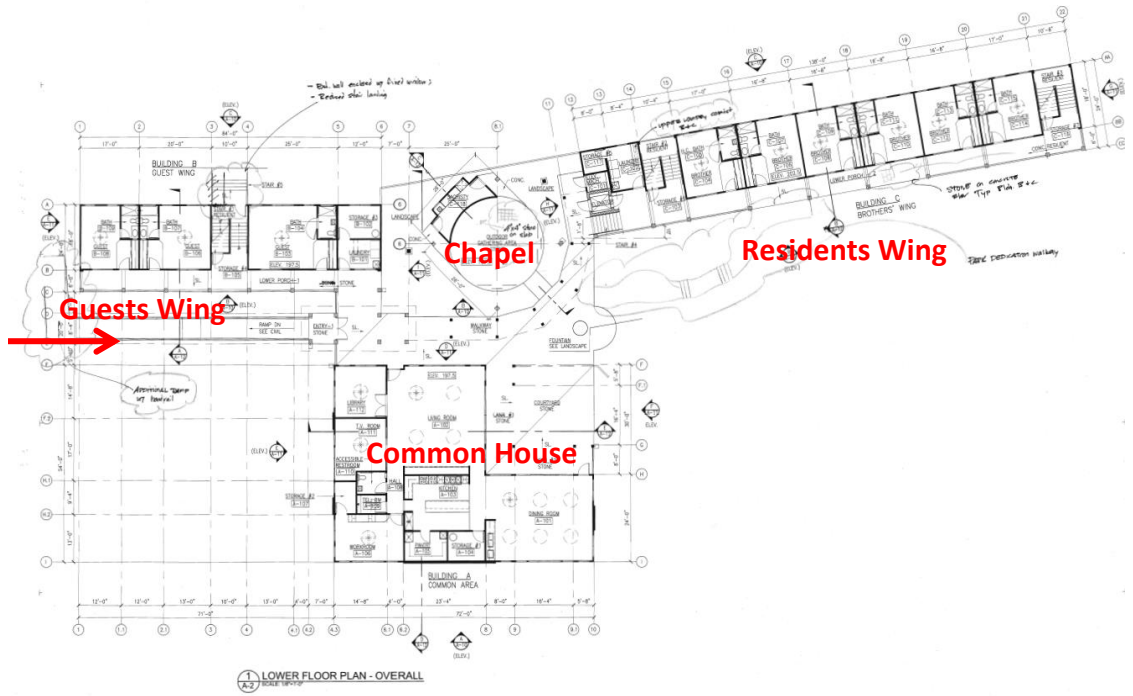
Hale Malia, Lower Floor Plan¹⁷¹
